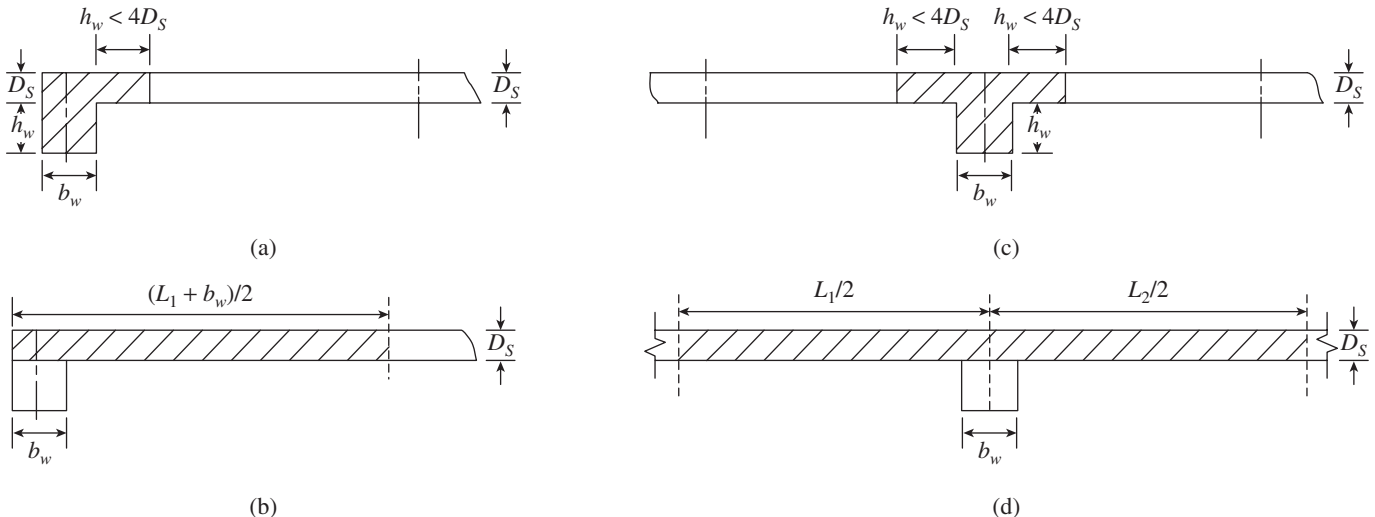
Definition of beam and slab sections for the calculation of α_b (a) Section for I_b —edge beam (b) Section for I_s —edge beam (c) Section for I_b —interior beam (d) Section for I_s —interior beam
